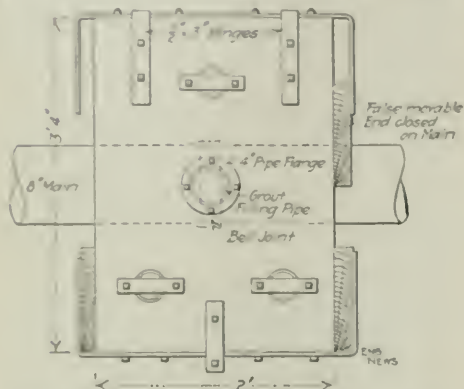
PLAN OF BOX FORM FOR REPAIRING LEAKY JOINTS
